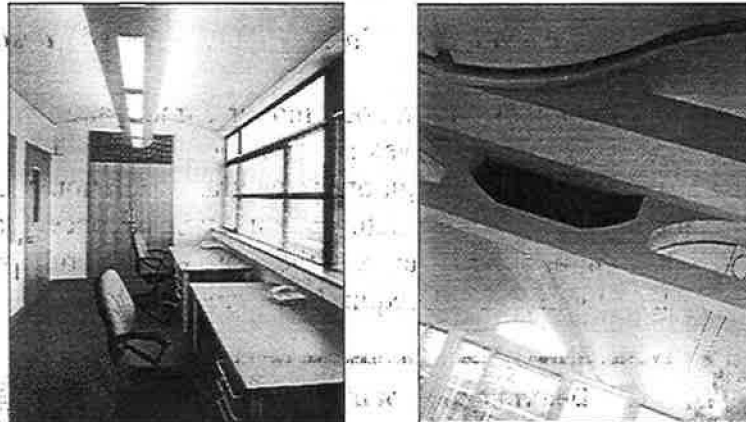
Exposed false ceilings (Canning Crescent Centre - The Environmental Building)
